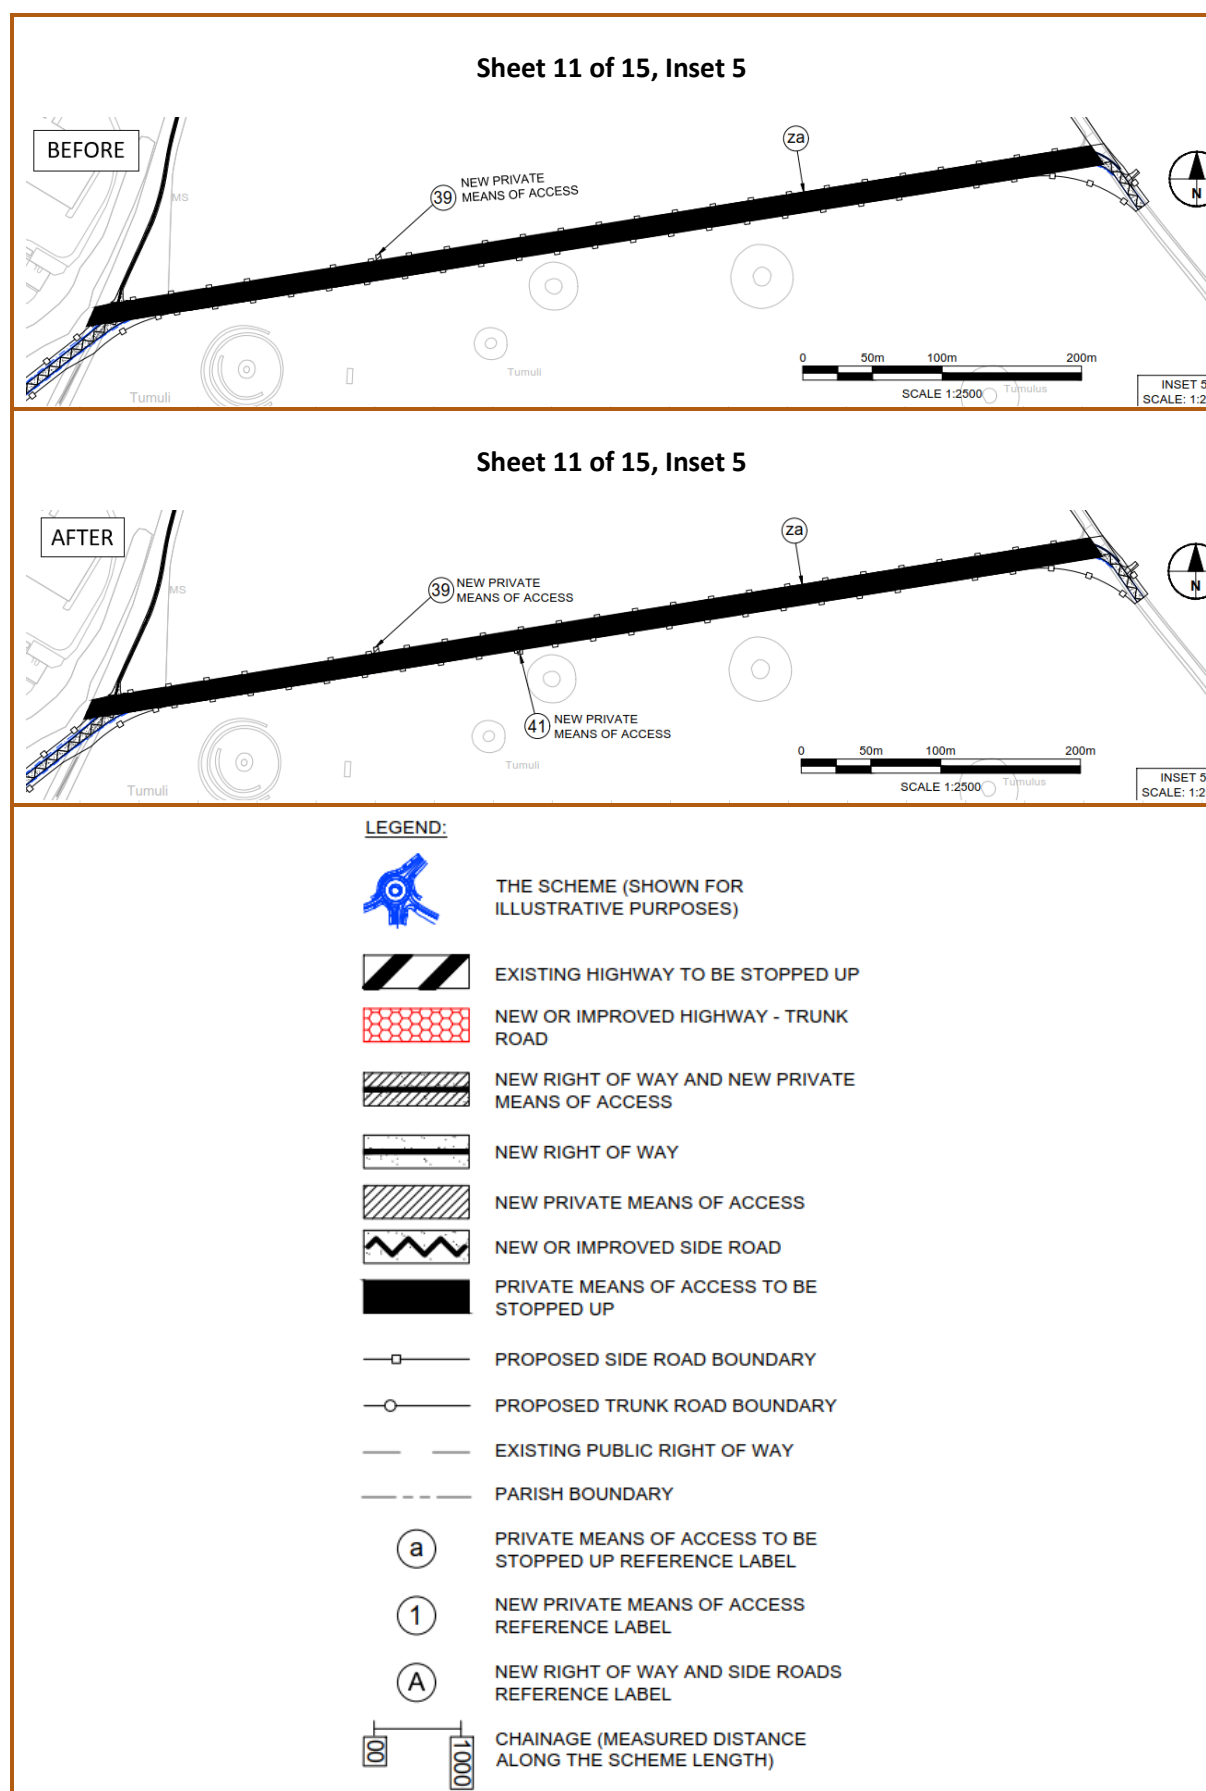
Extract from Rights of Way and Access Plans [APP-009]
